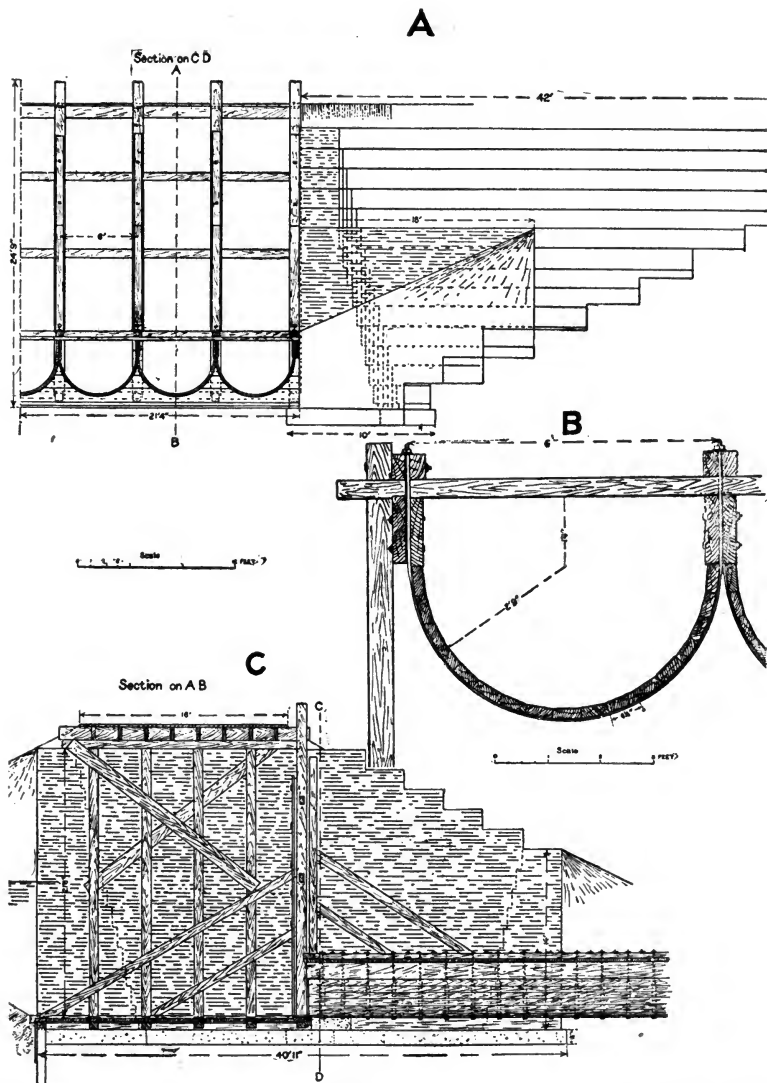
PLATE XVII.—CENTRAL IRRIGATION DISTRICT CANAL. ELEVATION AND CROSS-SECTION OF STONY CREEK CULVERT.
